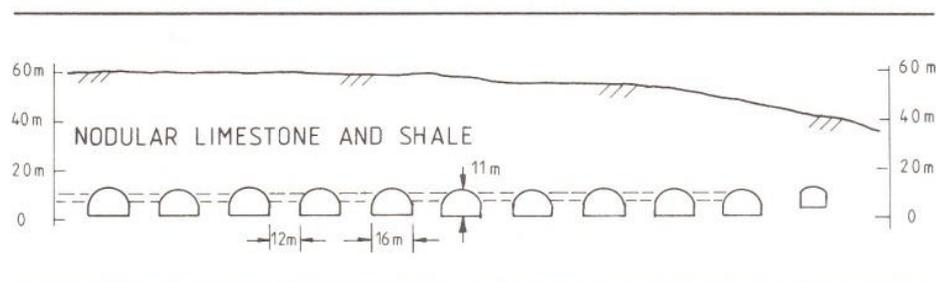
Vertical section through the VEAS sewage treatment plant, Oslofjord.
